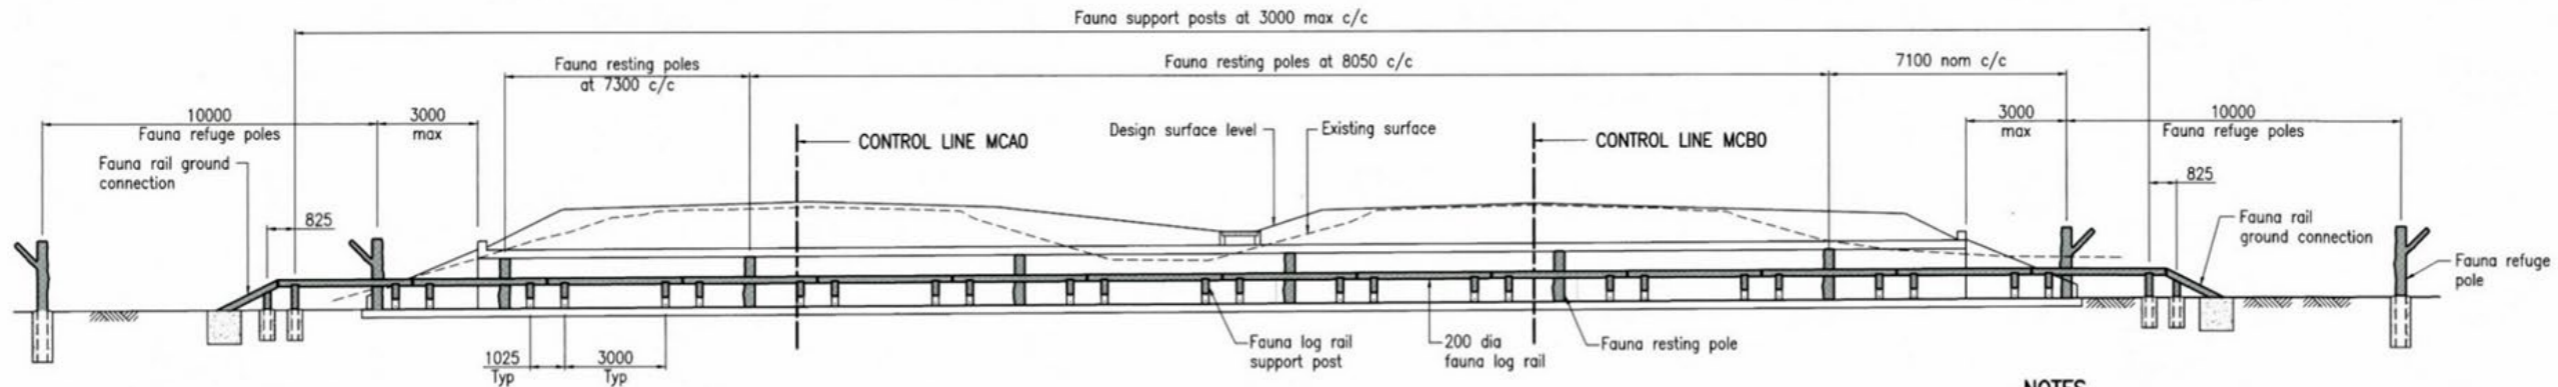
(d) - Wooden beam in culvert fauna crossing
